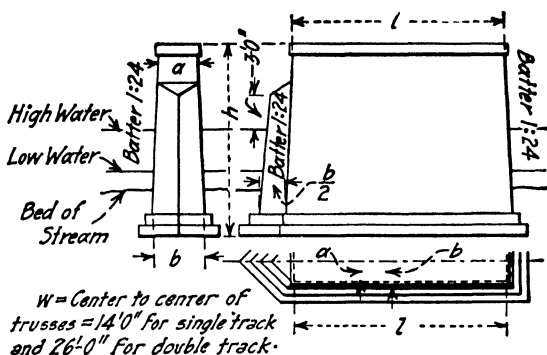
QUANTITIES IN MASONRY PIERS FOR THROUGH SPANS, ILLINOIS CENTRAL RAILROAD.
